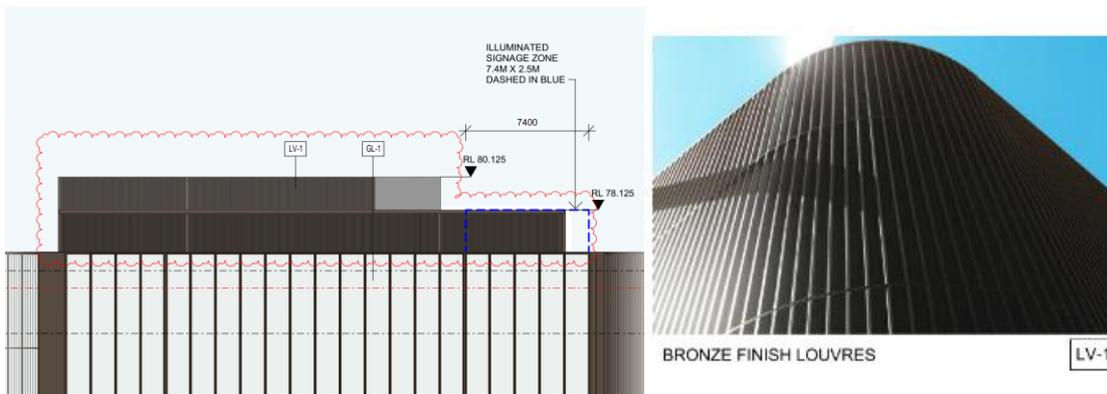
Amended rooftop plant screening and example of vertical louvres proposed
